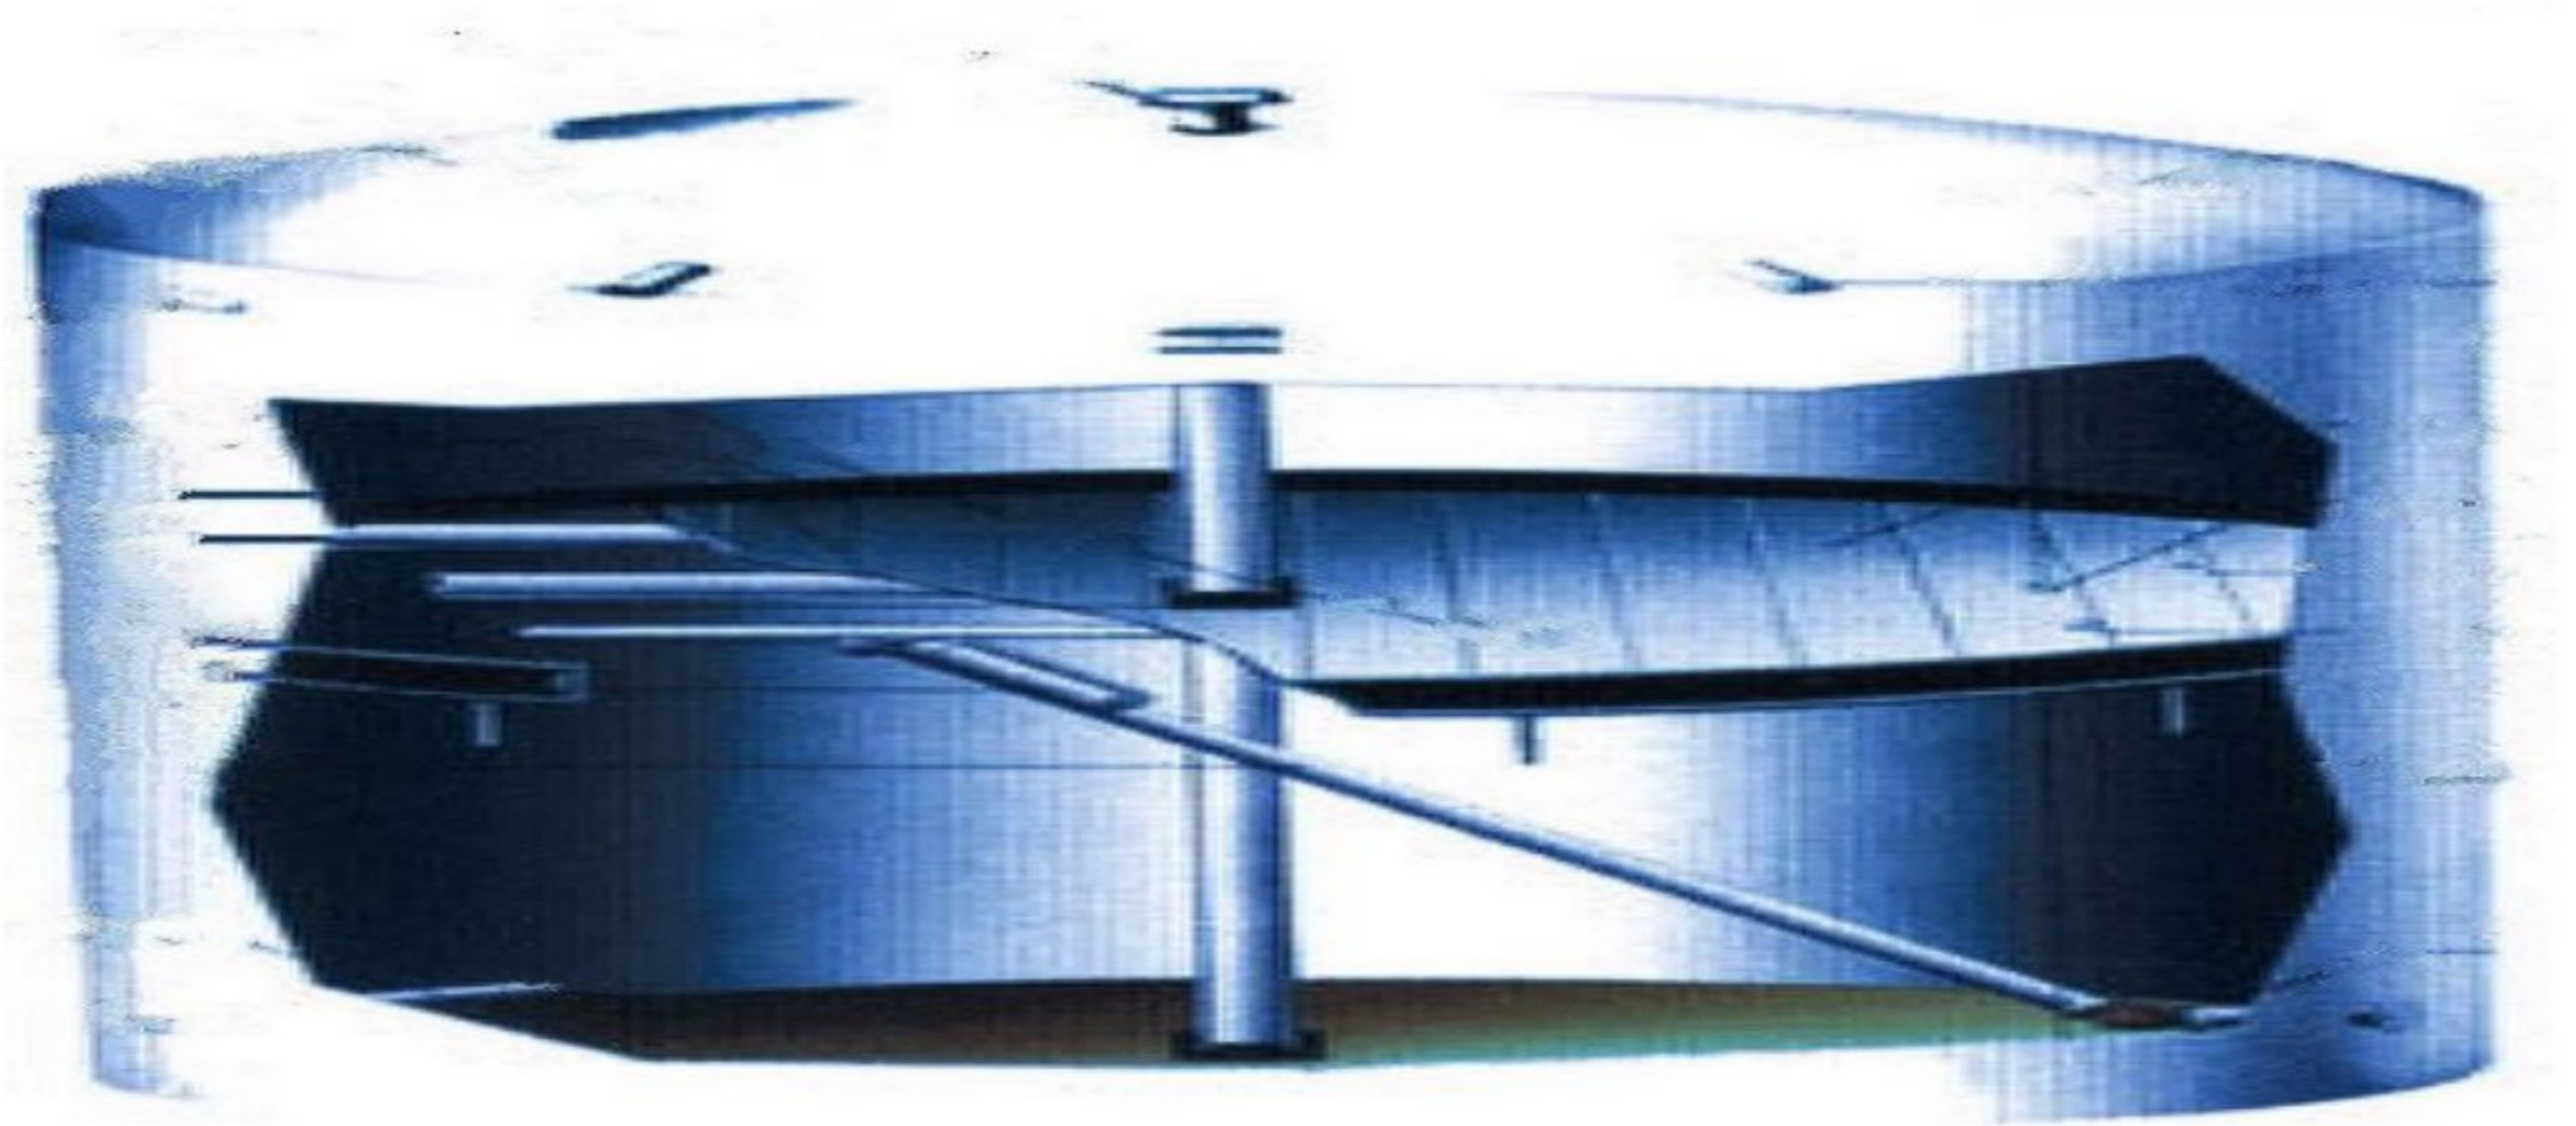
Vertical cylindrical tanks with a central column with semi-circular and floating roof
